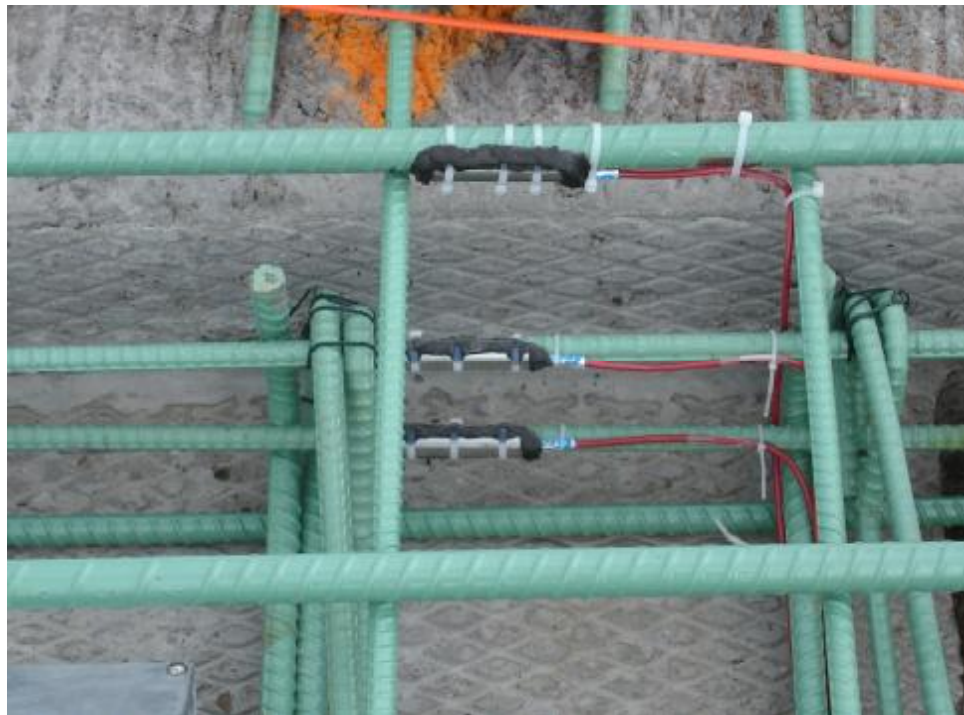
Photograph of 3 VW spot-weldable stain gages installed on the longitudinal reinforcement at east end of east span
